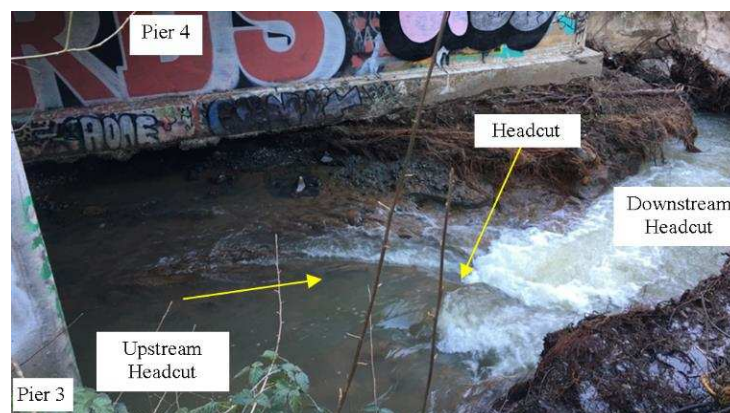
Looking at Pier 4 (Span 3). A 0.6 meter to 1.2-meter-high head cut in Span 3 moving upstream toward Piers 3 and 4.
